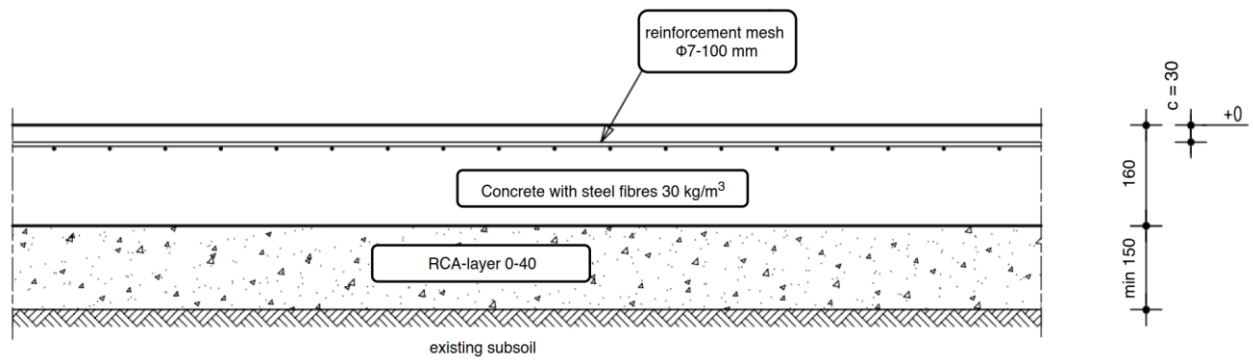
Reference jointless concrete floor with a thickness of 160 mm, a top reinforcement mesh of $\Phi 7-100$ mm with a concrete cover of 30 mm and a steel fibre content of 30 kg/m^3 added to the concrete mixture. The floor is realised on an RCA-layer that meets the requirements.
